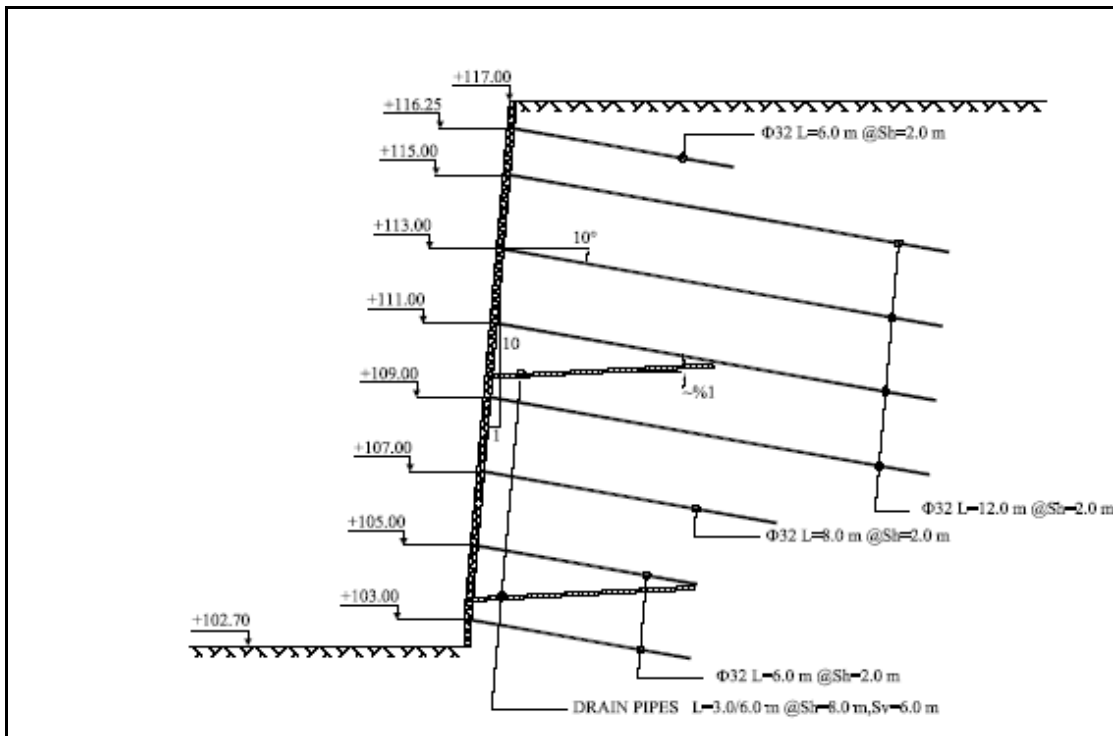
Besler Warehouse, detailed cross-section of inclinometer 1
